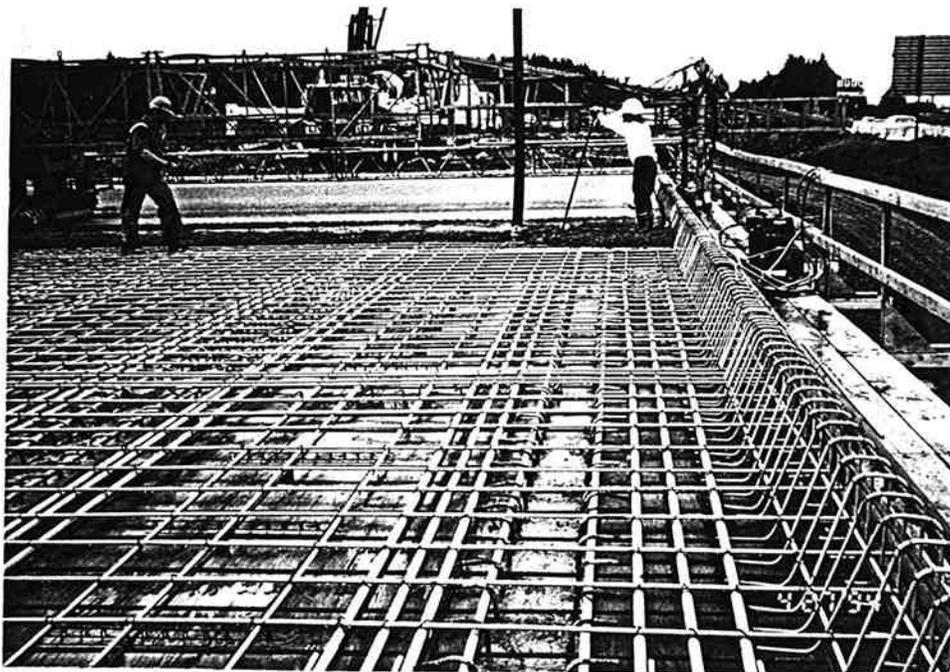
The deck of Santiam Overflow No. 4 was placed in April 1994. Note the isotropic layout of the rebar.
